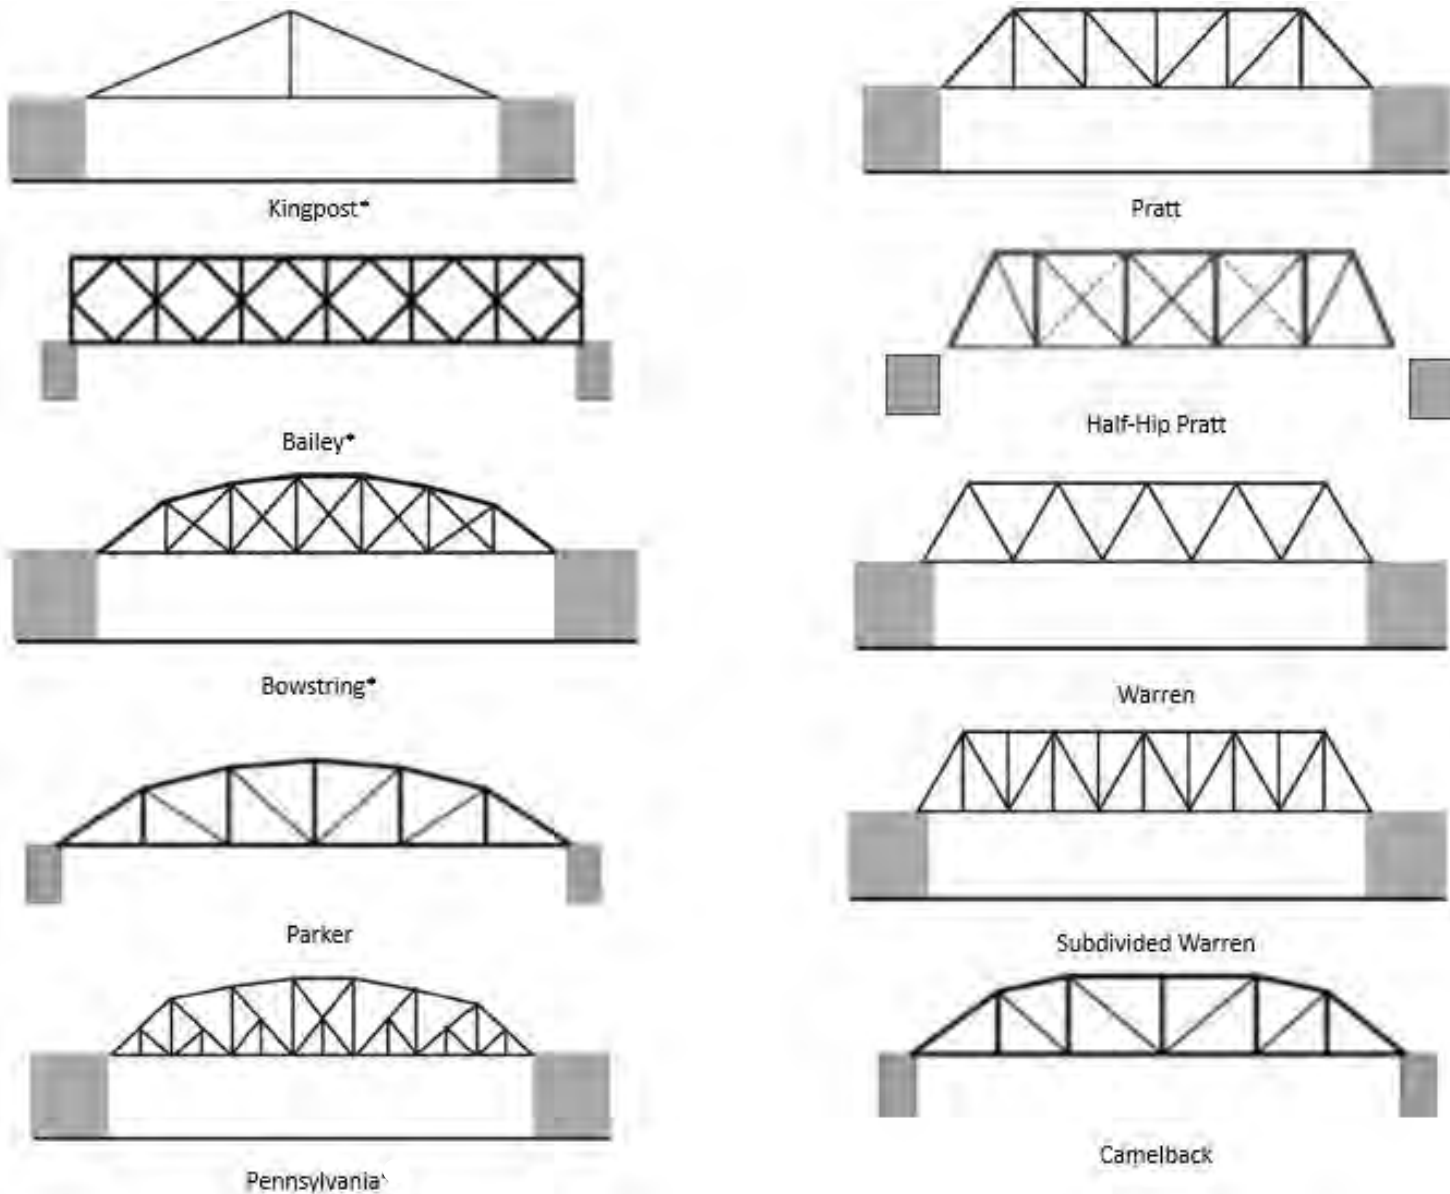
Truss bridge types extant in Wisconsin. Those denoted with an asterisk are non-standard truss configurations.
